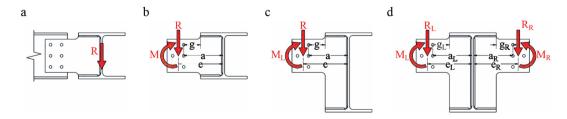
Full-depth stiffened extended beam-to-girder shear tab: (a) location of inflection point, (b) single-sided (the beam and girder have the same depth), (c) single-sided, (d) double-sided.
